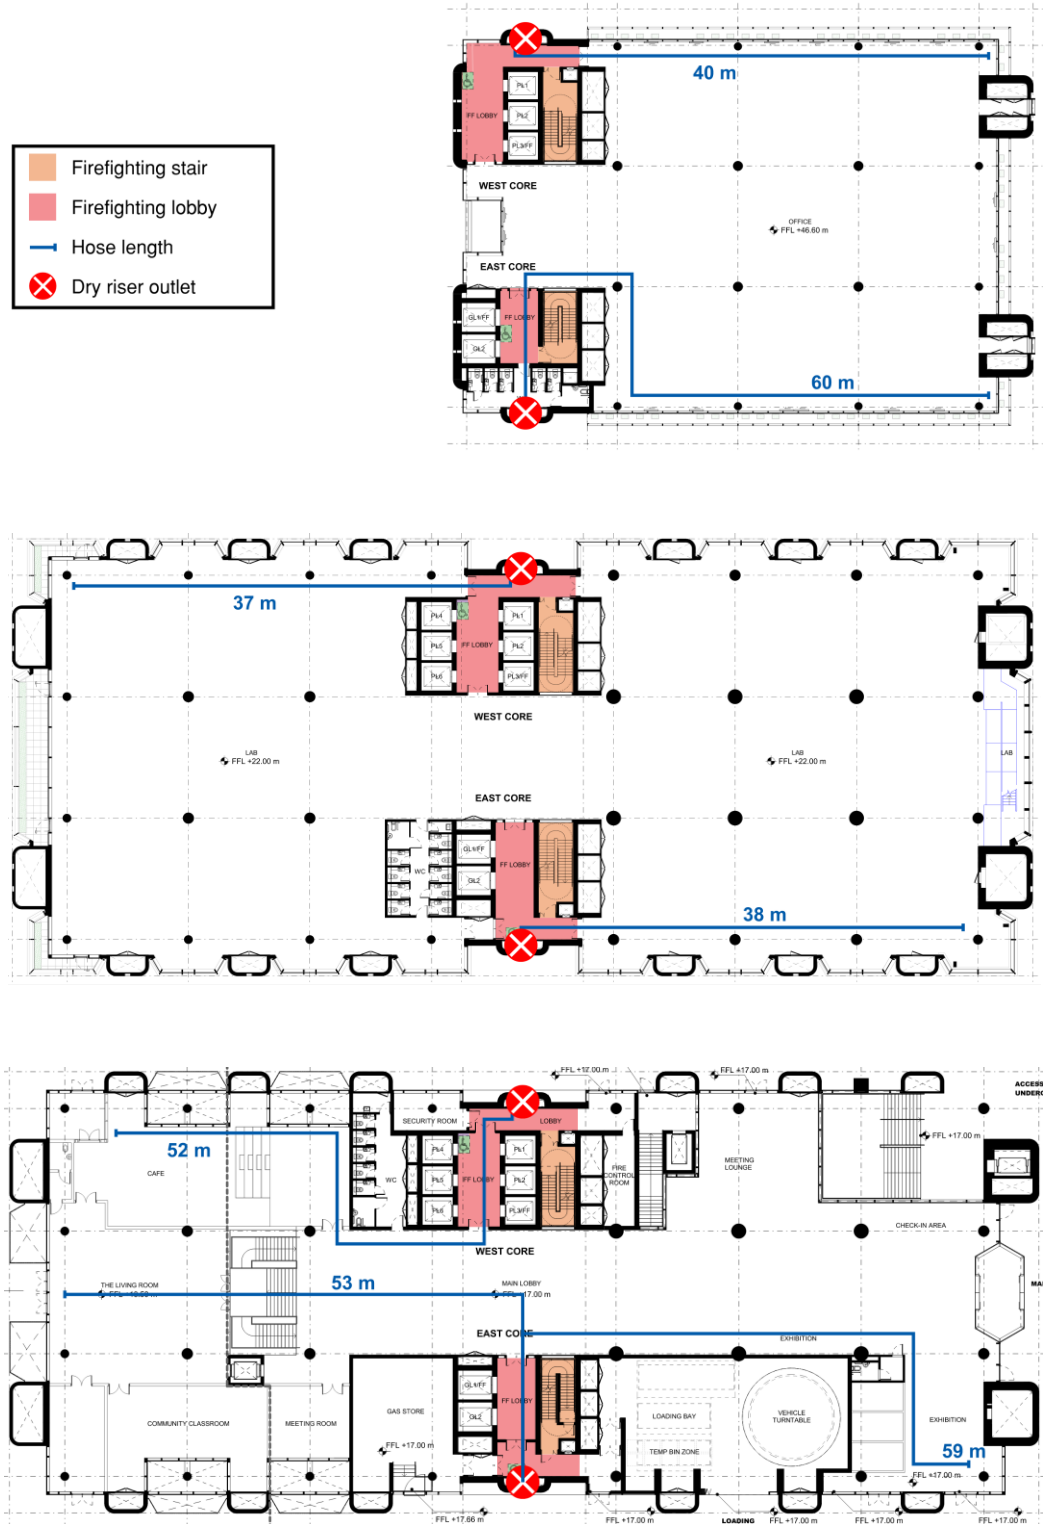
Mark-ups of Ground floor (L00), a typical laboratory floor (L01) and office floor (L07) showing FF shafts and hose coverage.
